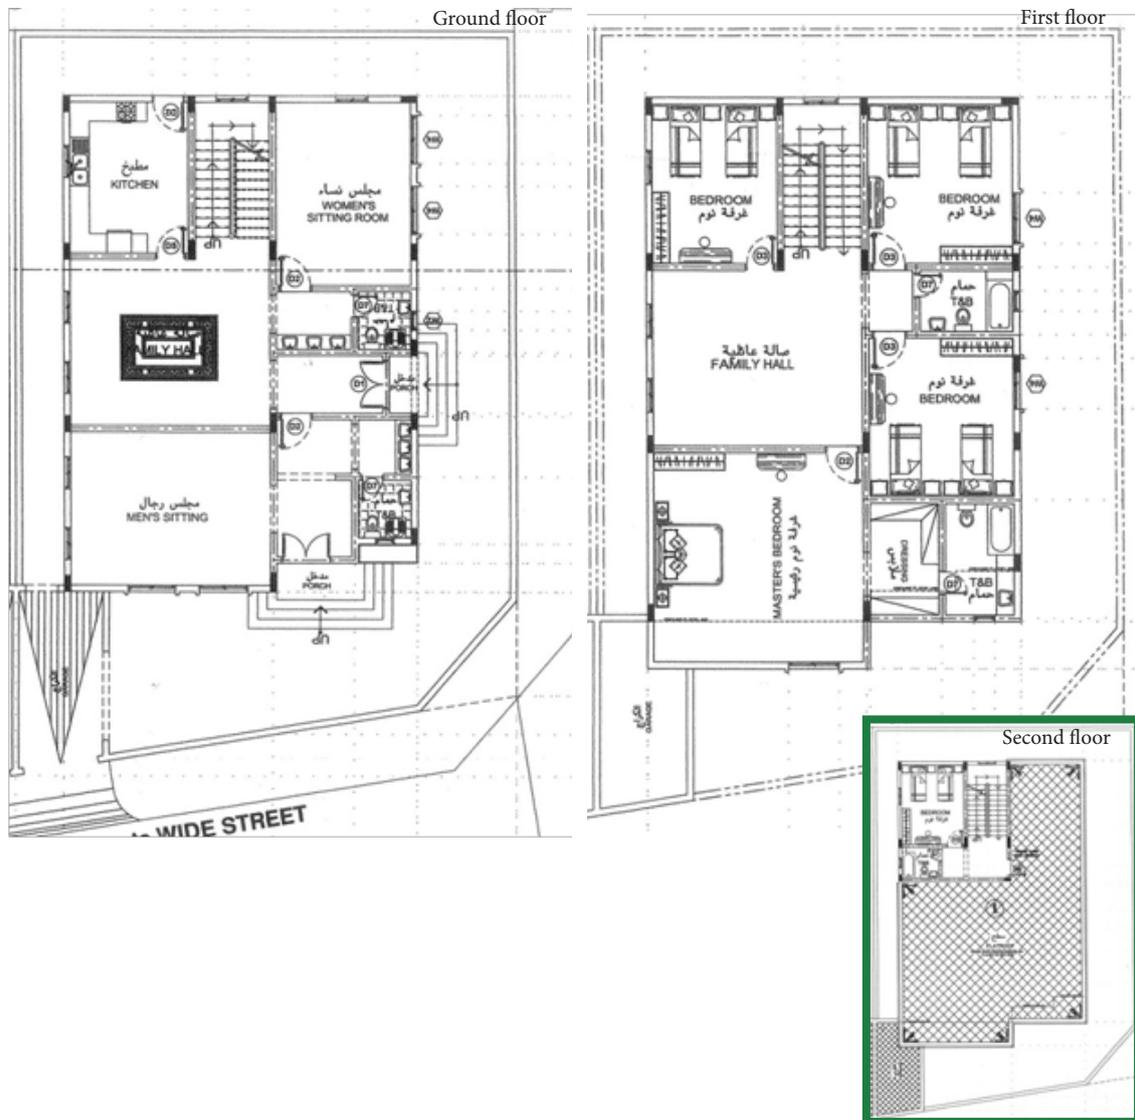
An example of a Contemporary house in eastern province Ground Floor, First Floor and Second Floor. Source: Architect studio
